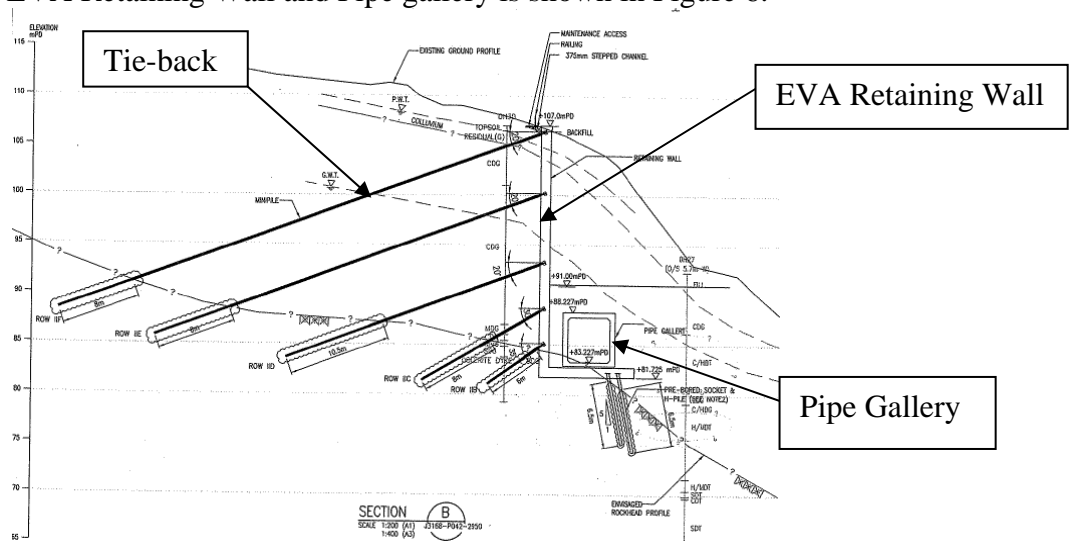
Section of EVA Retaining Wall and Pipe Gallery
